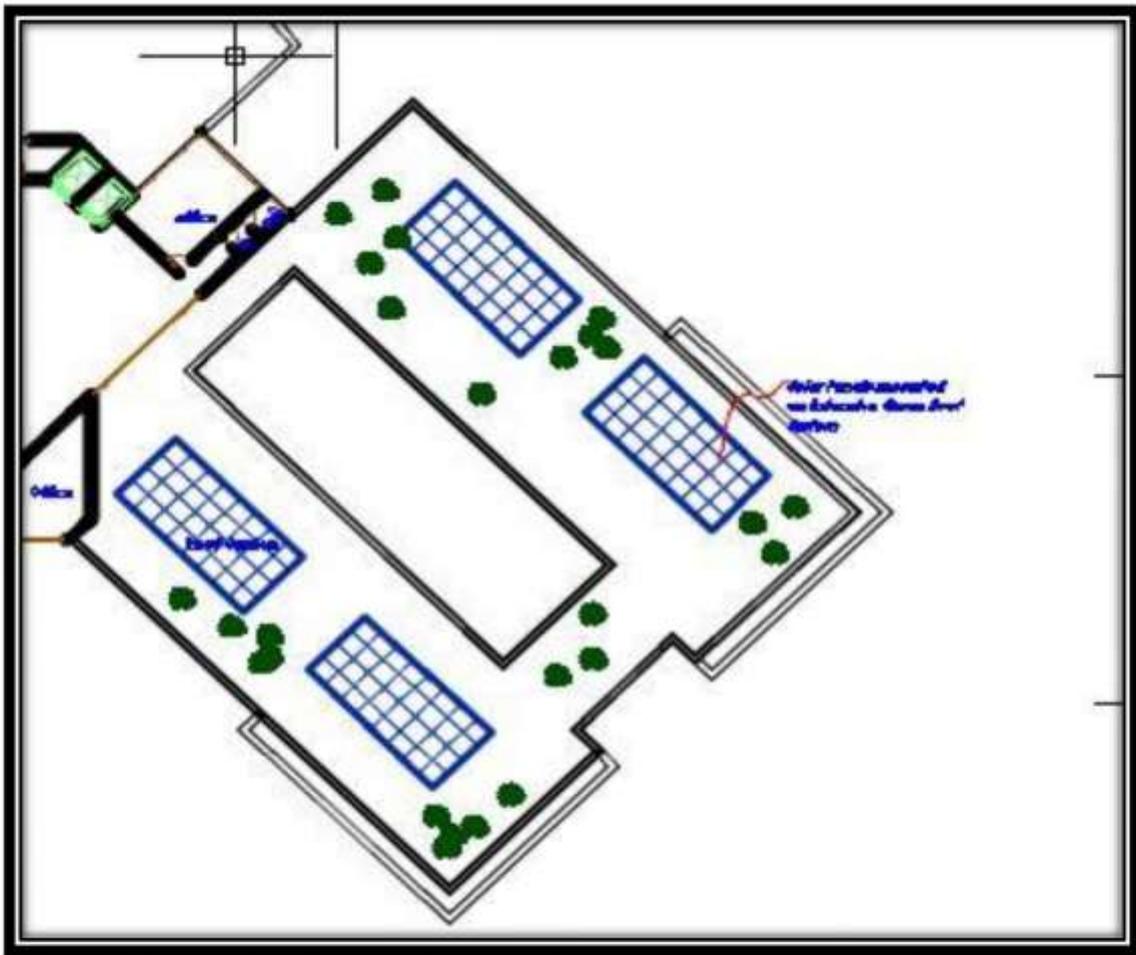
Section of Roof Plan Showing Installed Solar panels for energy generation (Source: Researchers, 2018)
